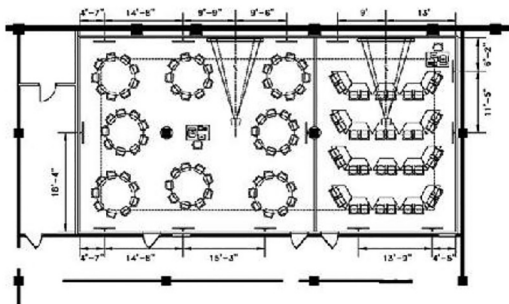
The PAIR-up room is flexible. Demountable walls and wheeled furniture are crucial for swift layout changes. Schema from [17].
